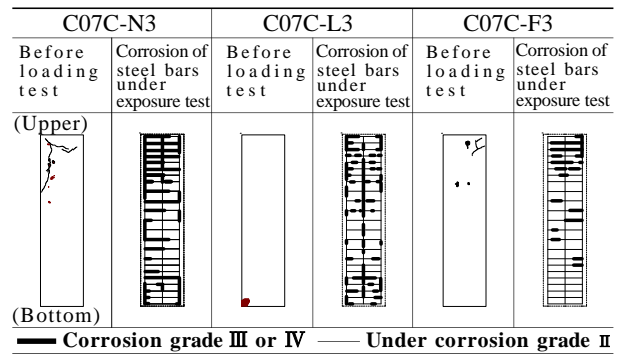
Cracks of cover concrete and corrosion of steel bars in RC column specimen.
